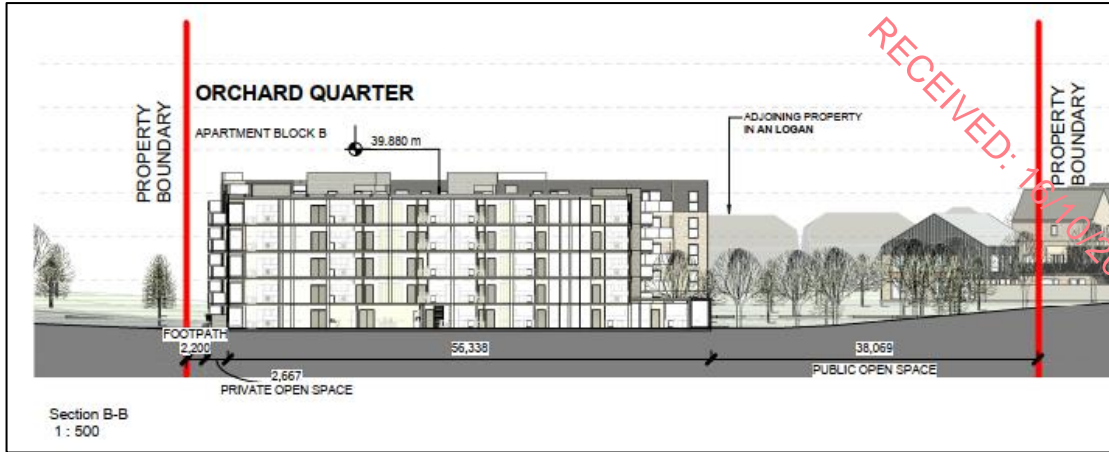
Section View of apartments in the Orchard Quarter – Excerpt Extracted from the Planning Drawings.
